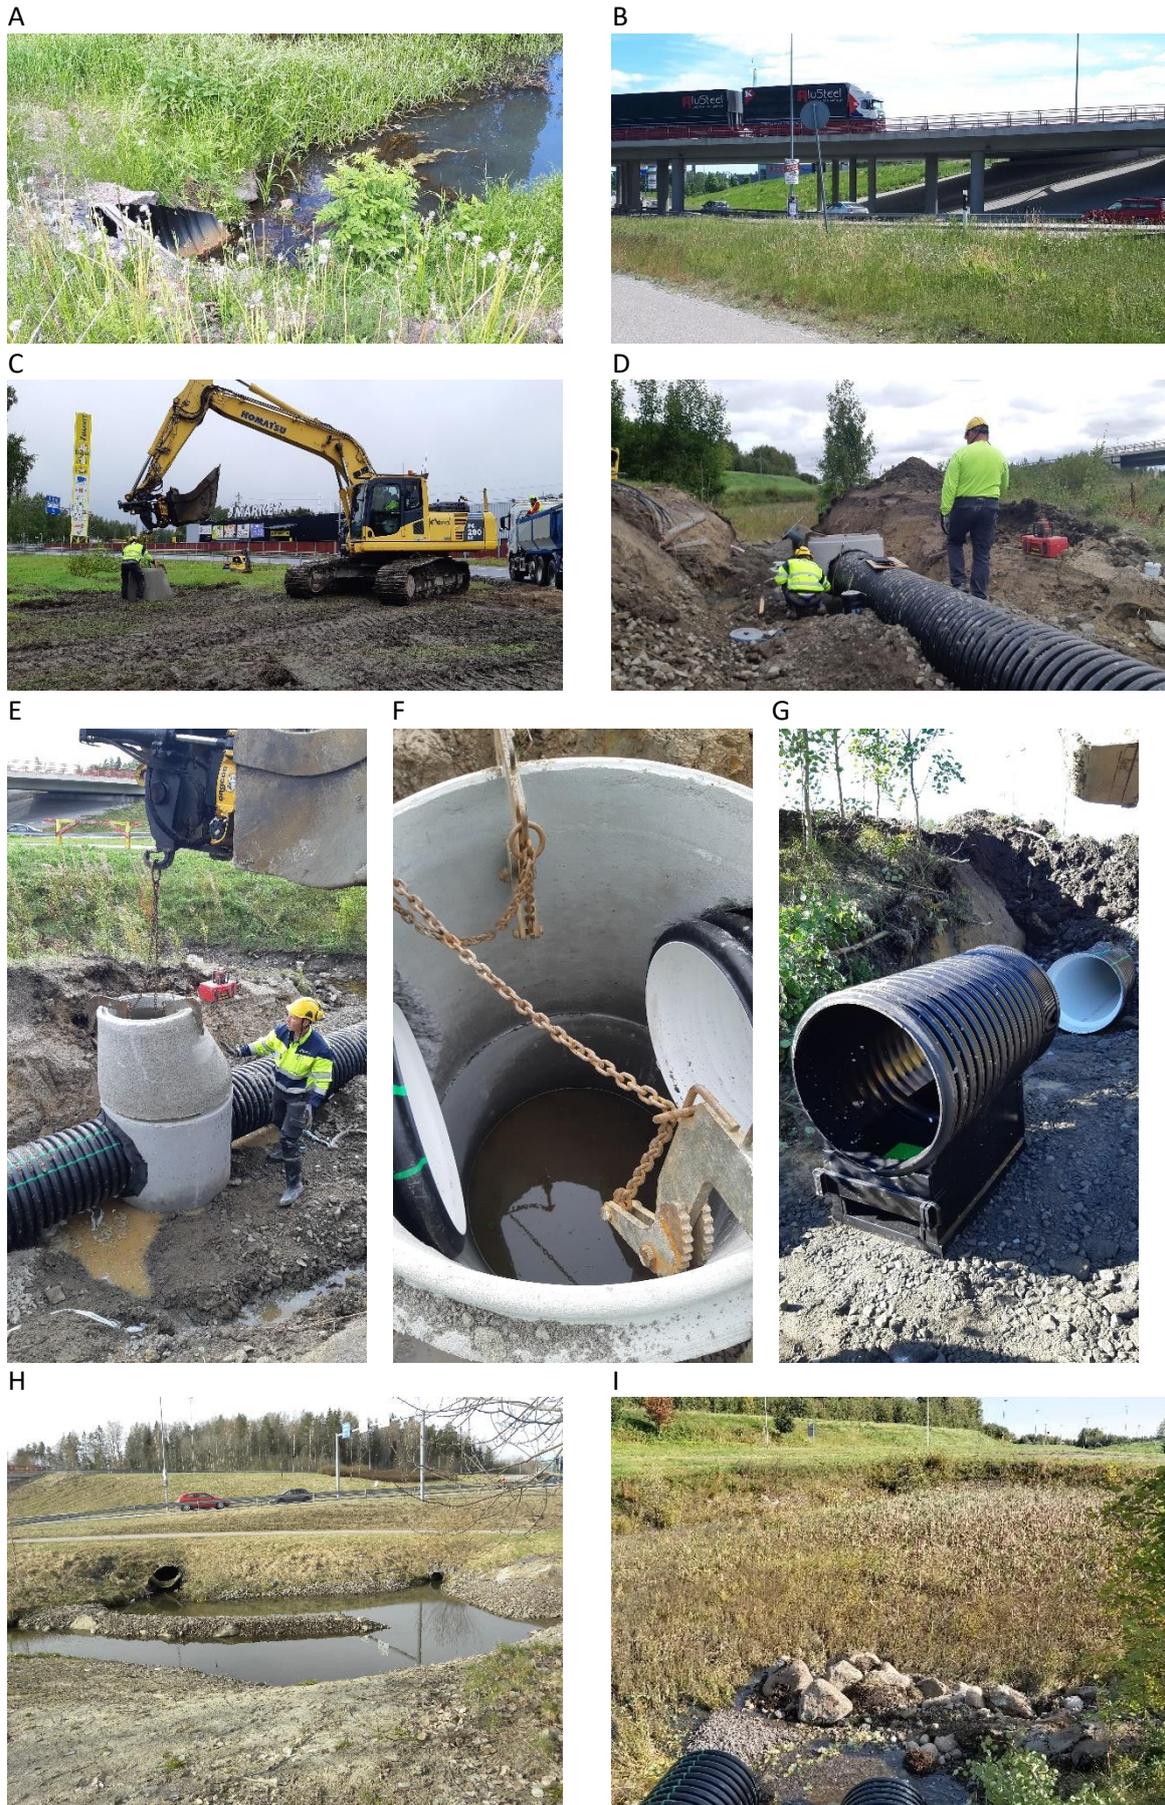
Highway 6 ramp CW and construction: A...B) CW before implementation, C...G) construction, and H... I) CW site after modification. H) influent to settlement pond before the filter, I) secondary settlement pond and outflow pipes from filter.
